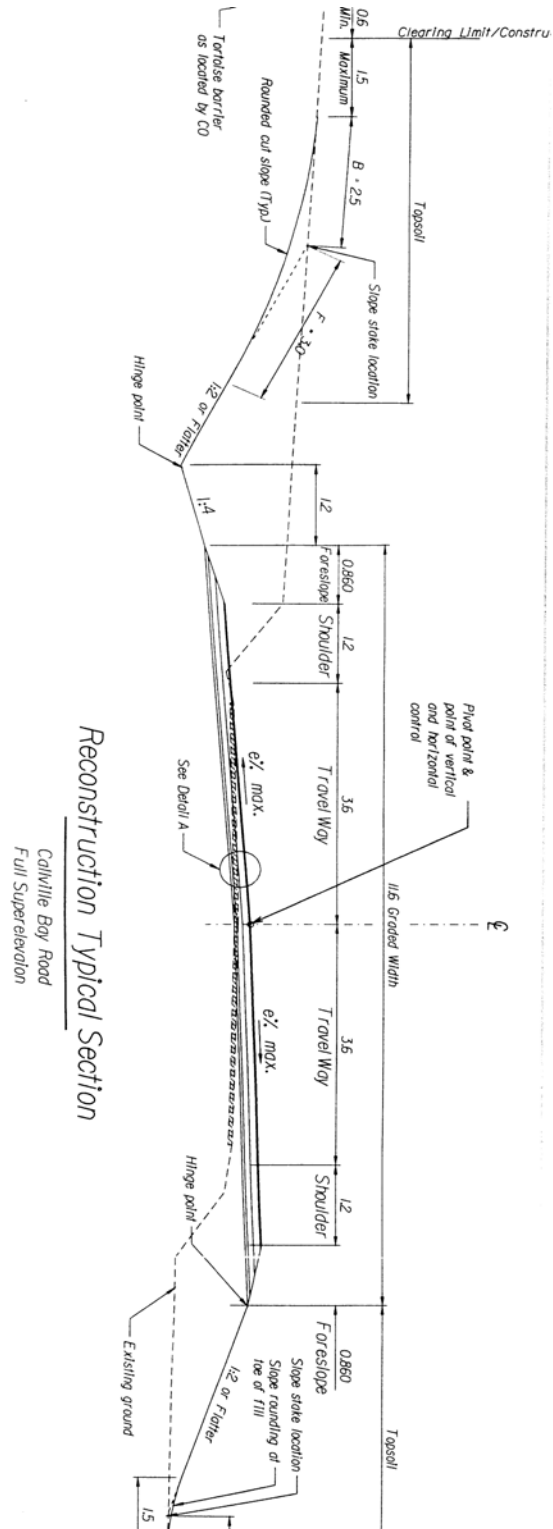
TYPICAL RECONSTRUCTION SECTION
